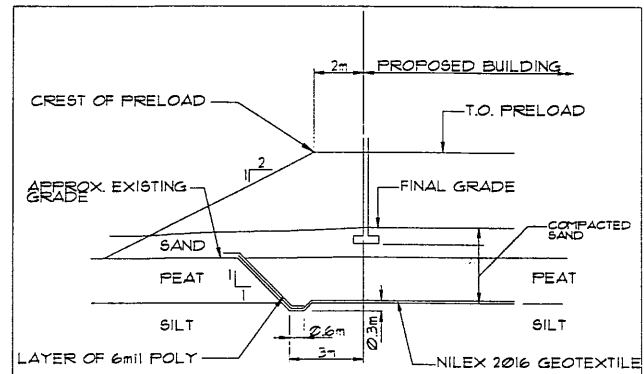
(Section 1, on fig. 2) Showing relative location of building preload and excavation.
